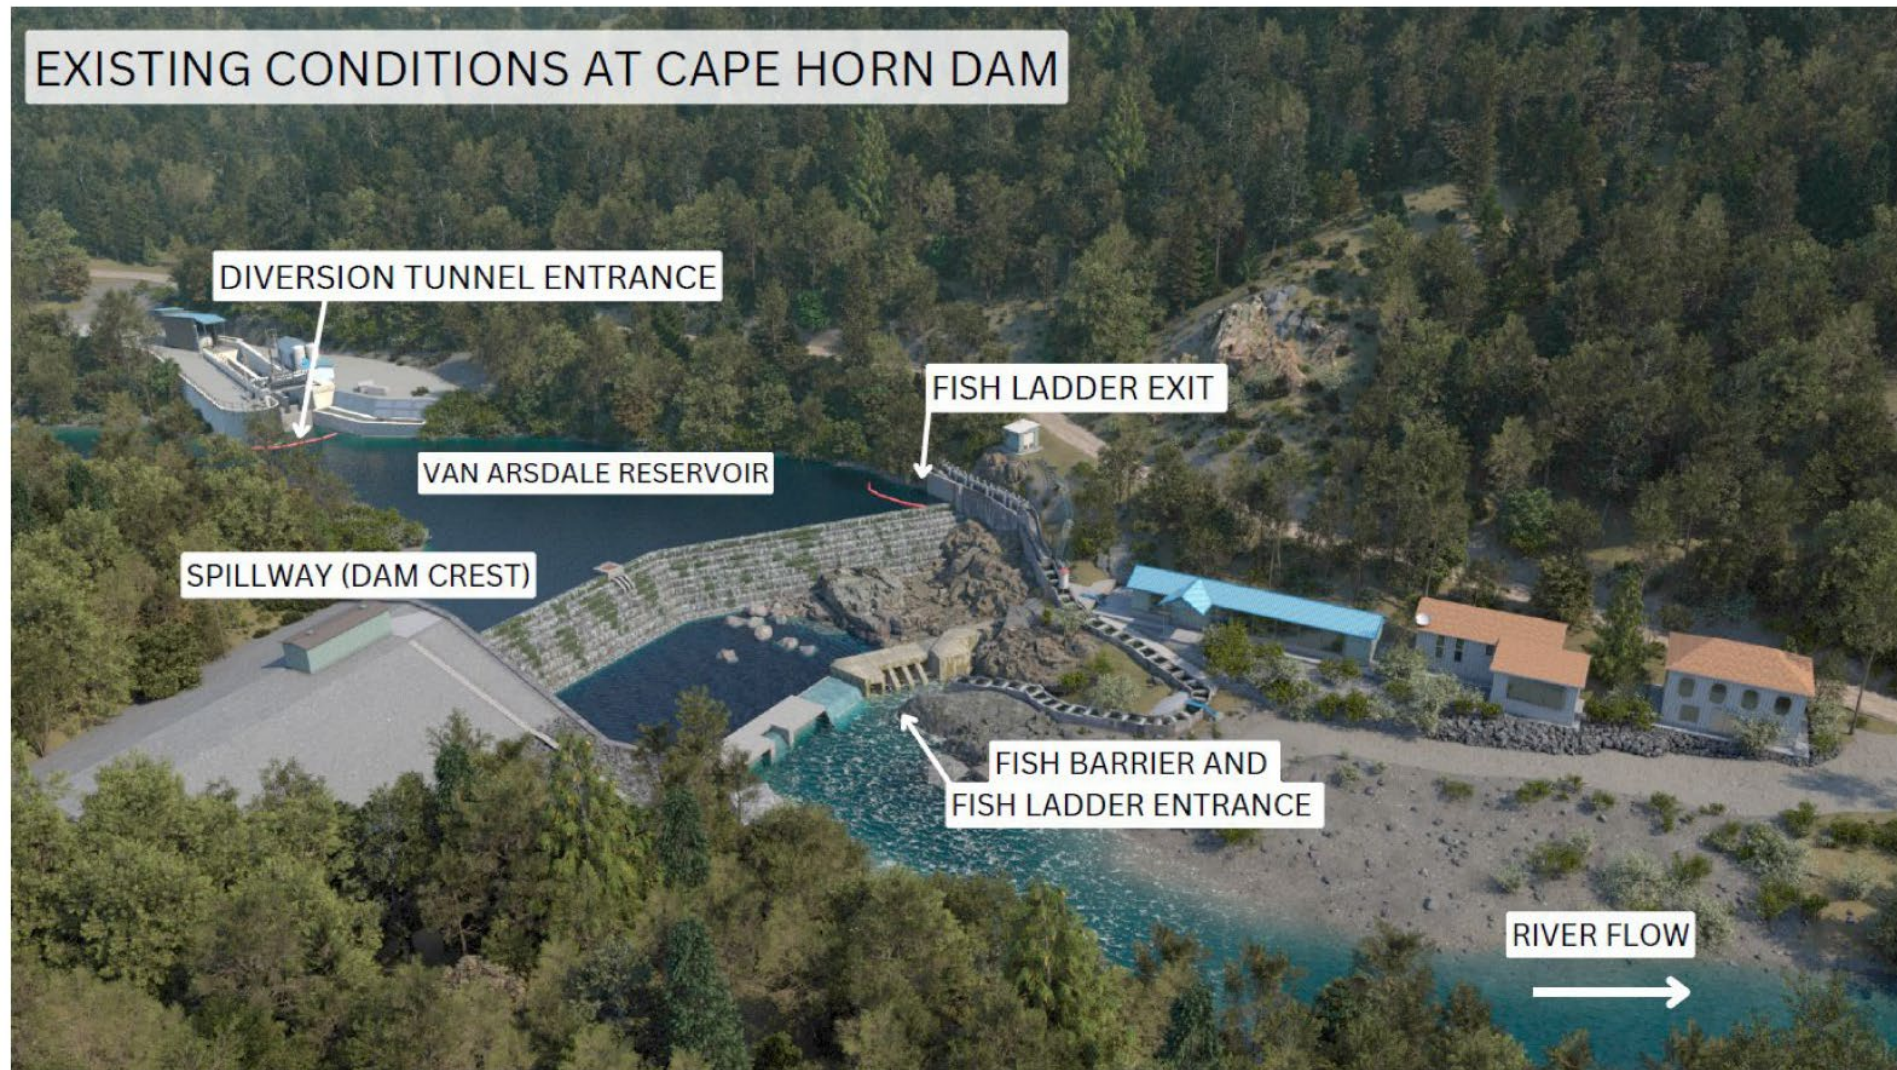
Existing conditions at Cape Horn Dam (artist rendering).
